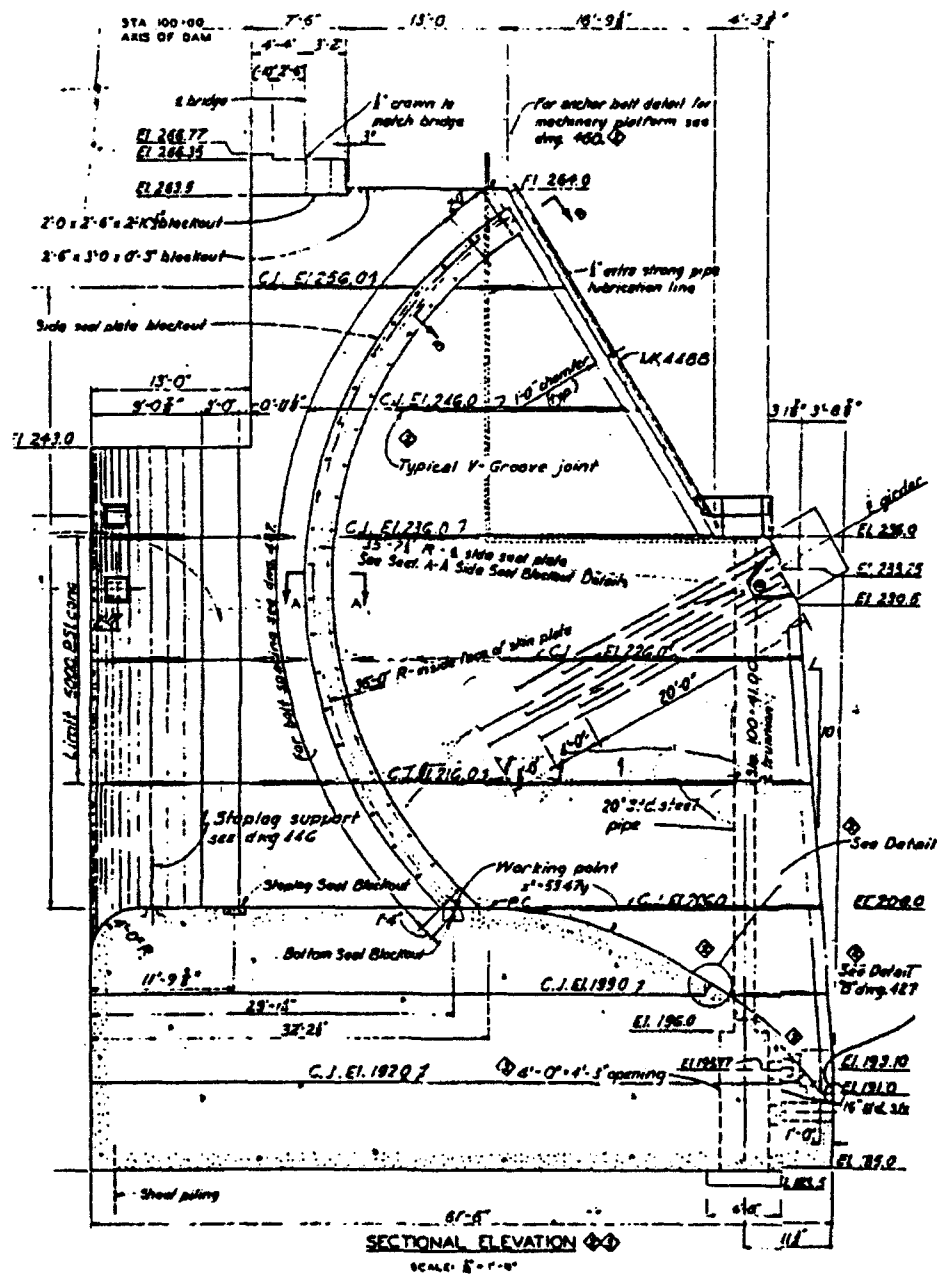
Dam pier plan and elevation (Sheet 1 of 3)
